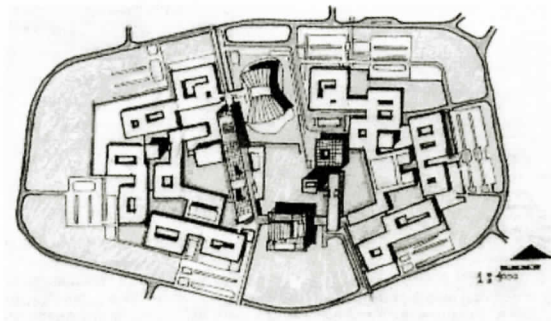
Site plan of University of Baghdad, Source: Fry and Drew, 1964, 183.
